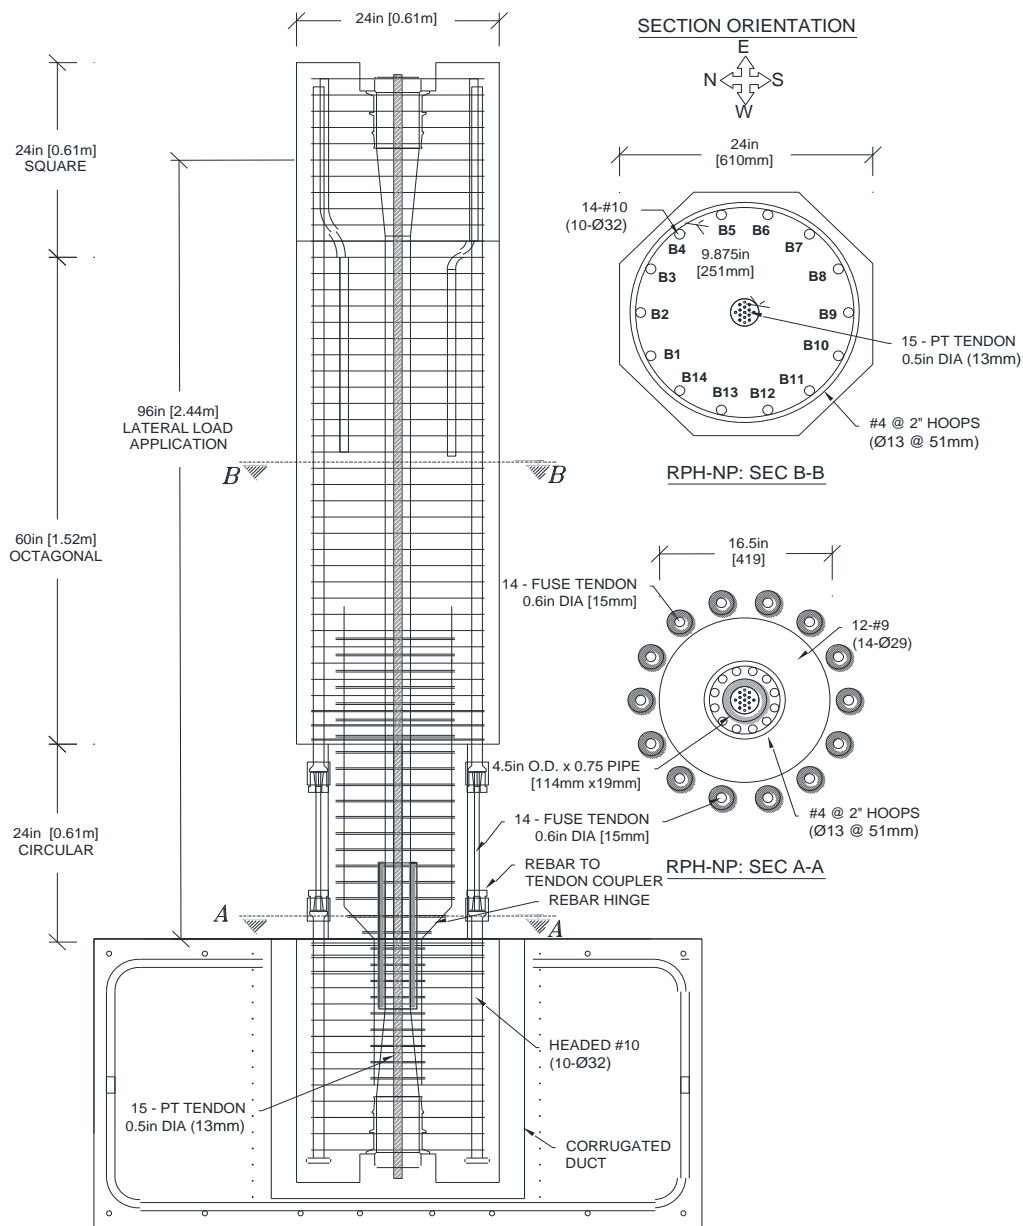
Reinforcement Detailing of RPH-NP Column
